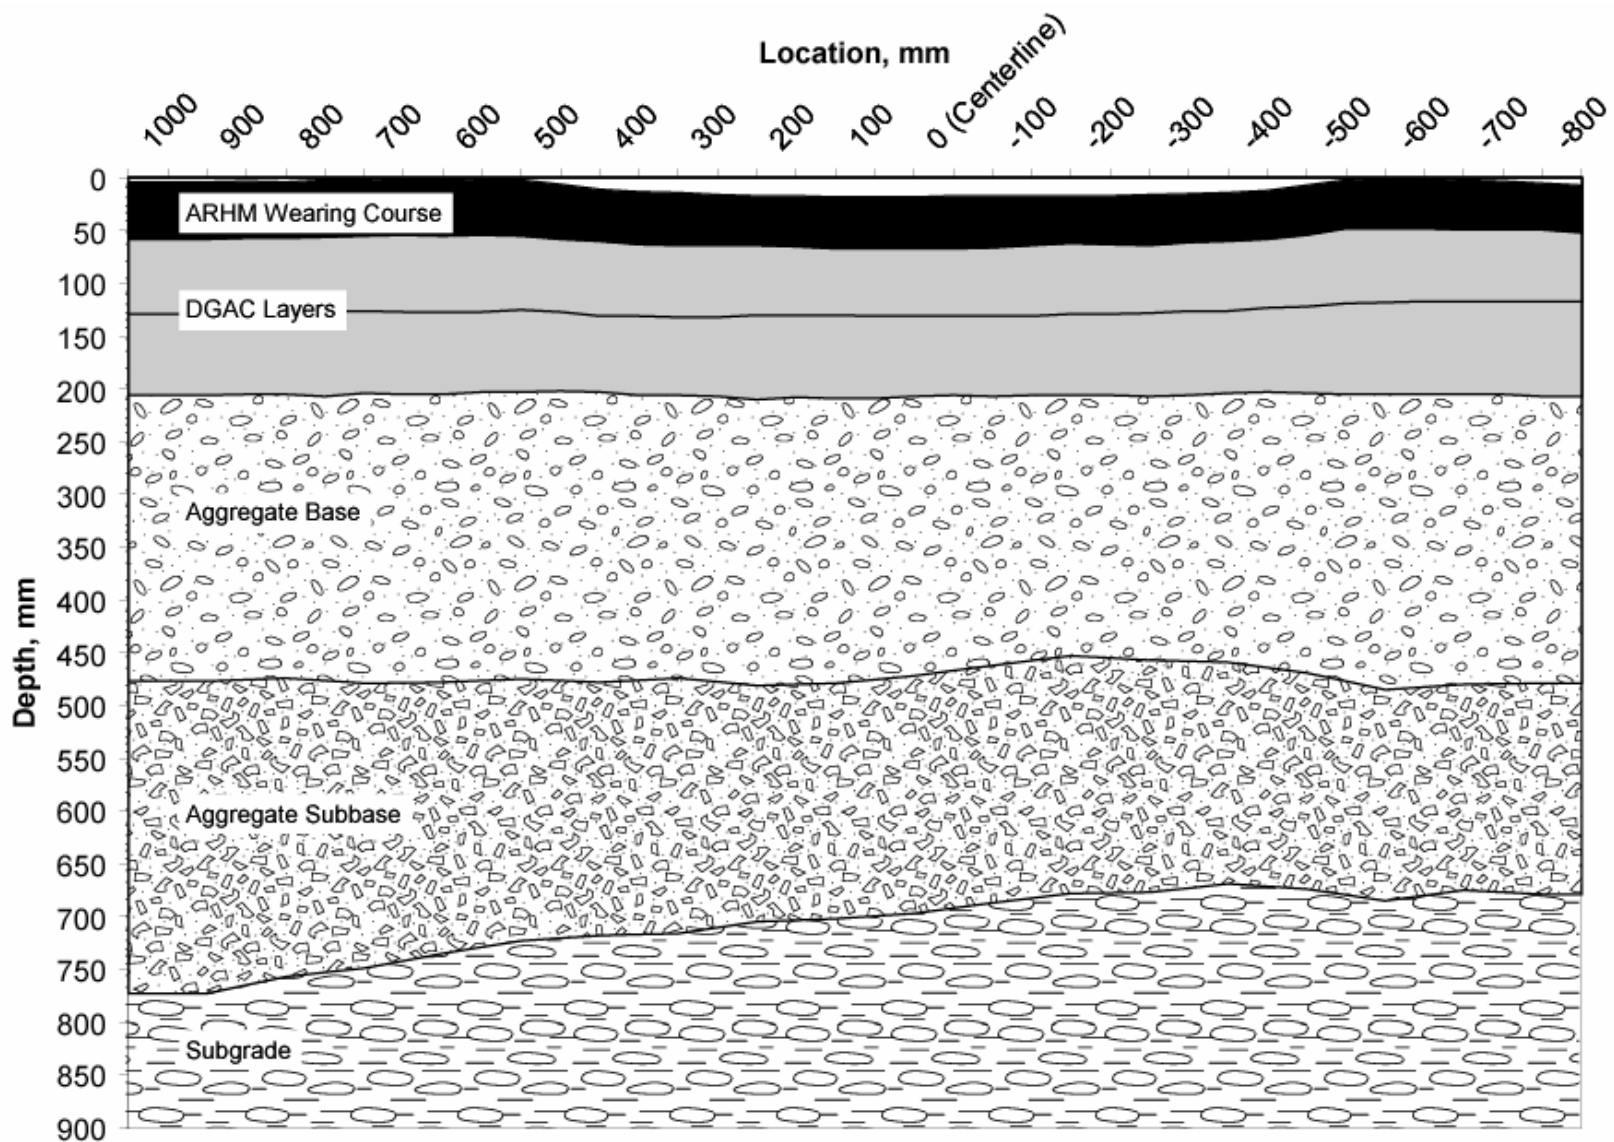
Trench data, north face of trench at Station 8, Section 544.
